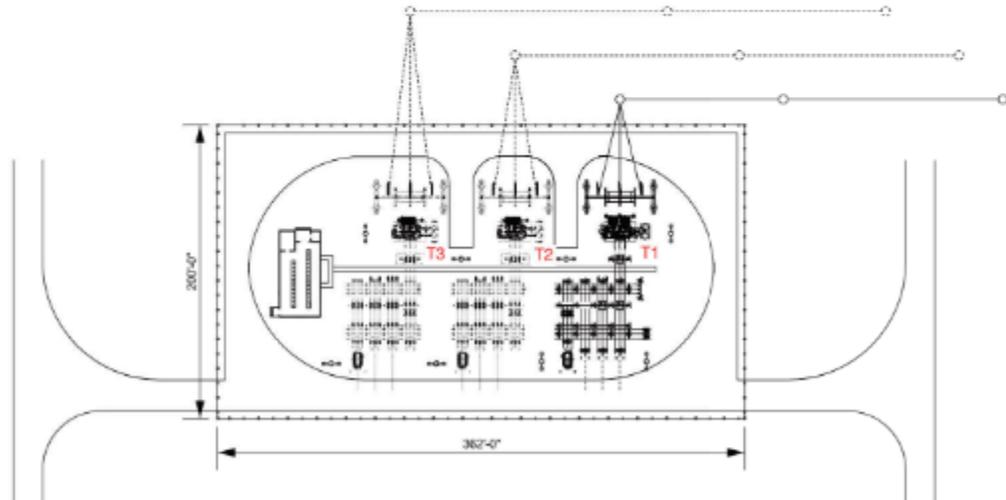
PROPOSED SUBSTATION ARRANGEMENT
